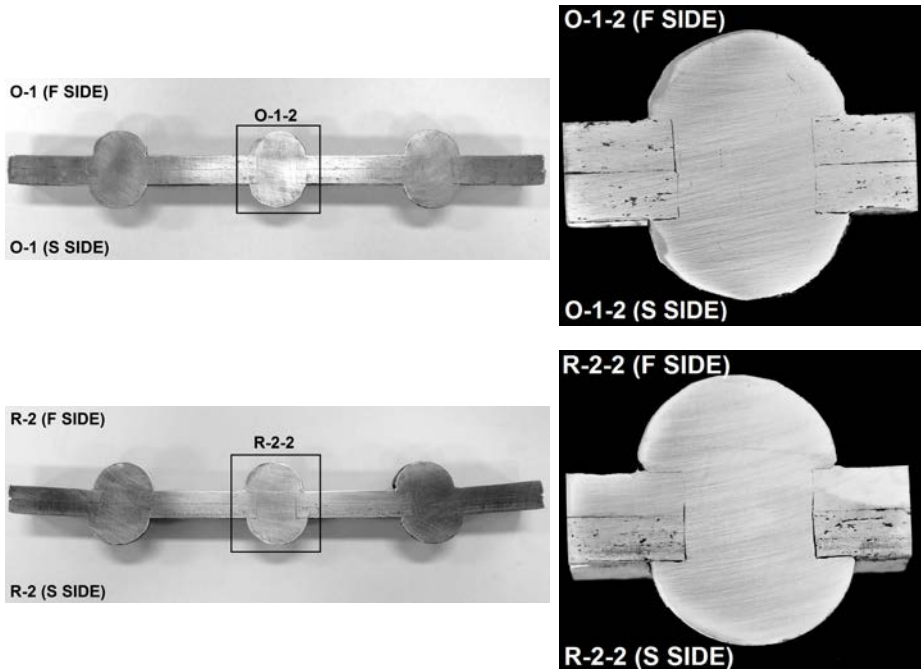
Longitudinal cross section of the O-1 specimen (top-left) and R-2 specimen (bottom-left), zoom showing the upset of the O-1-2 rivet shank (top-right) and R-2-2 rivet shank (bottom-right)
